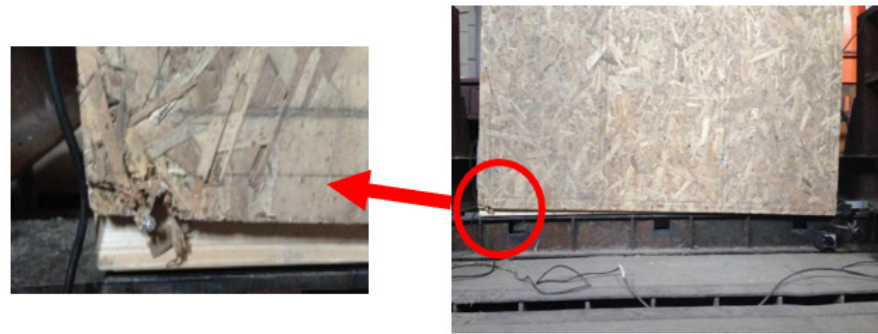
Failure of traditional light-wood-framed (LWF) shear wall (SW).
